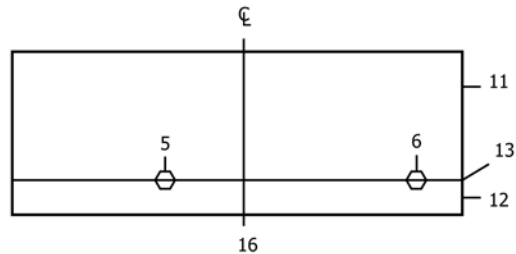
Thermocouple Layout on Visual Exterior Face of Calibration Wall (See 9.4)
